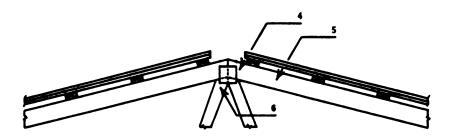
Location of test sites, Barn H. Truss No. 2, 18.2m (60') from north end. South elevation. Raised ridge cap, bird netting not shown.
